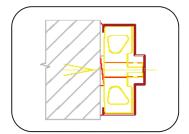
Typical WF installation butted against an existing wall. EMA anchor prep.
